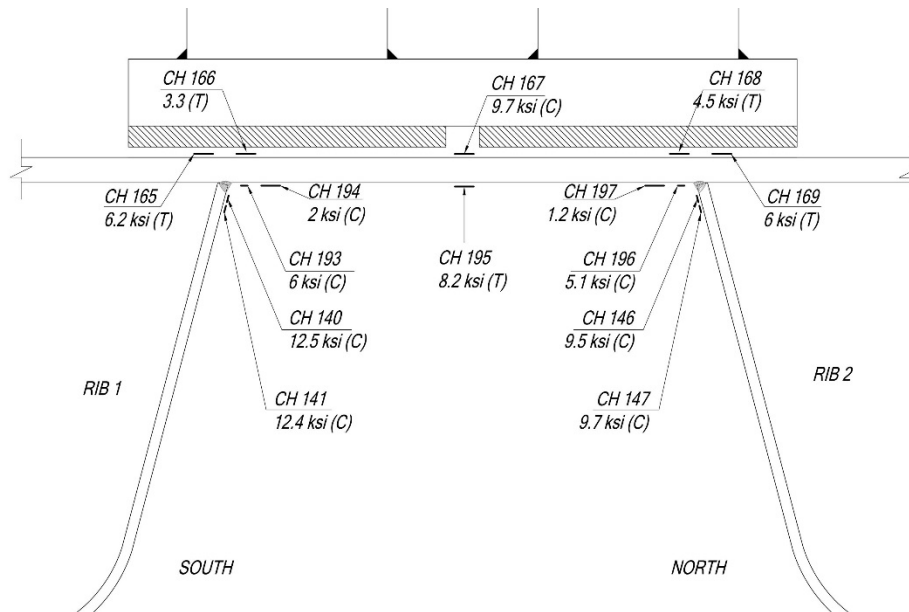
Measured stress ranges at the rib-to-deck plate connection at section Z-Z under south-east load pads
